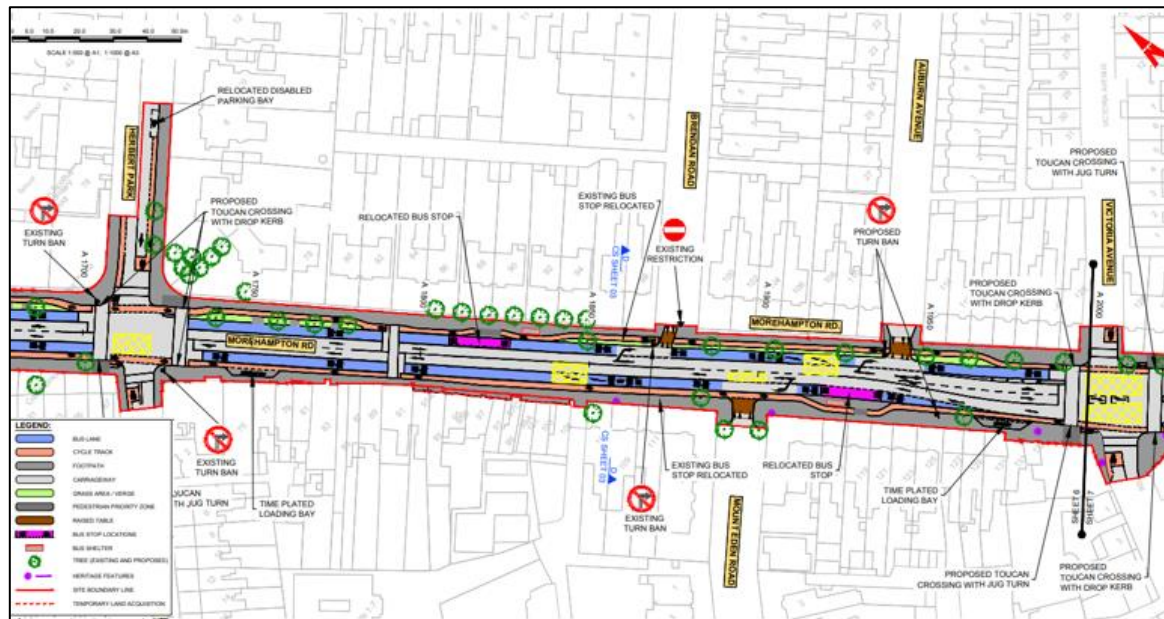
Extract from General Arrangement Drawings at Brendan Road (Sheet 06)
